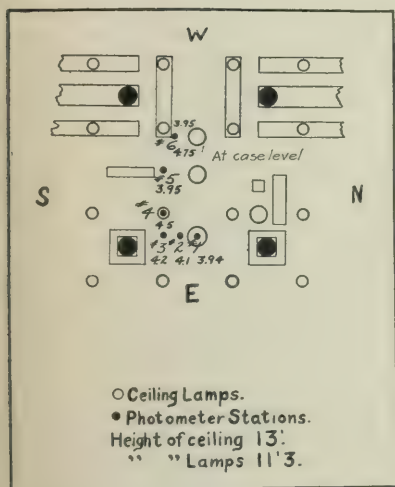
Section plan of fifth floor, (kitchen utensils), showing location of furniture, pillars, lighting units, test stations and illumination data.
